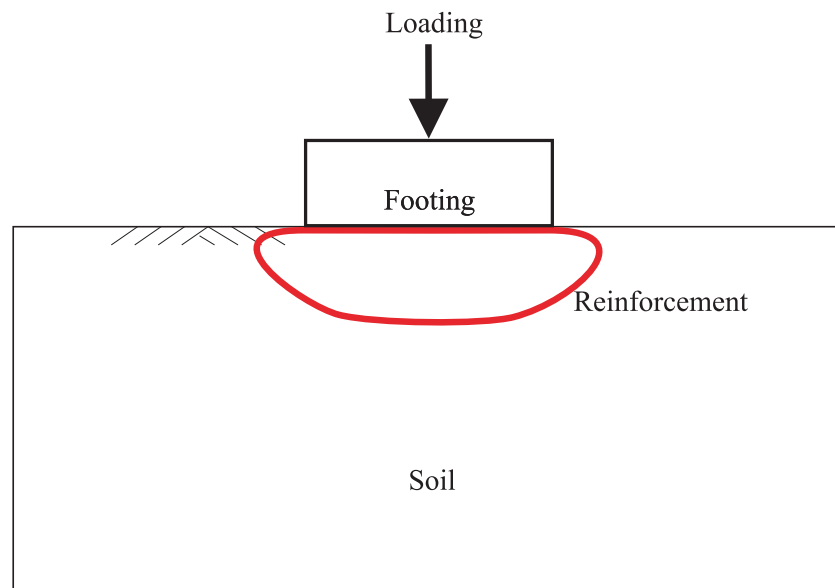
Illustration of the soil foundation reinforced with closed form reinforcement.
